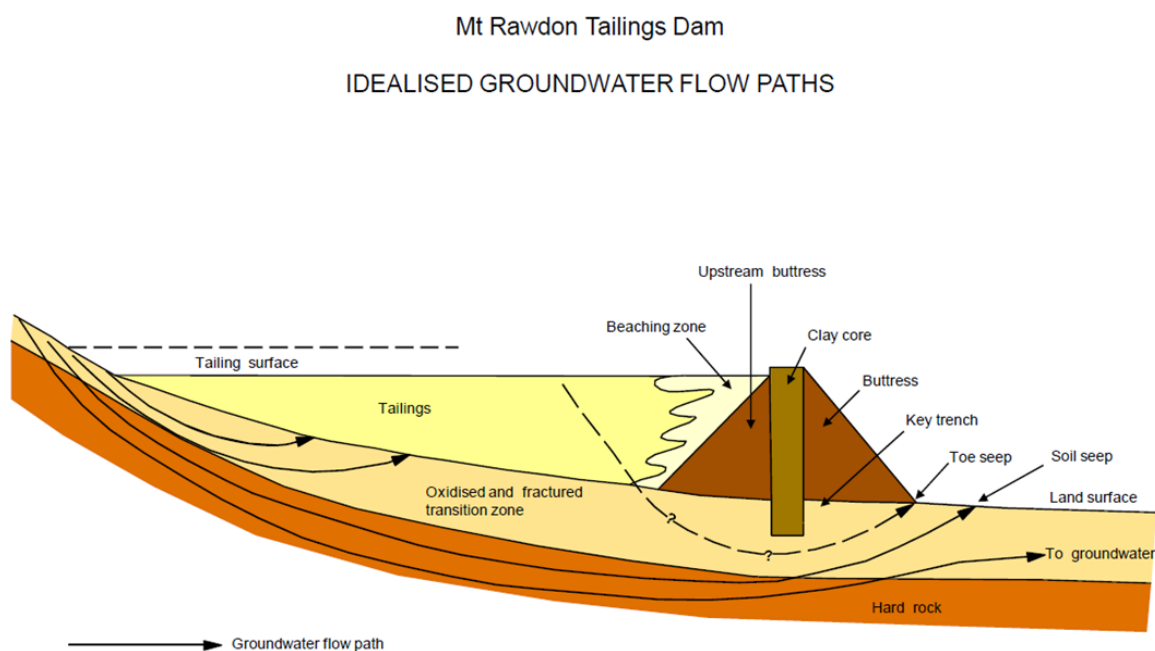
Idealised groundwater flow below the northern TFS wall (Source: Morgan, 2007)
